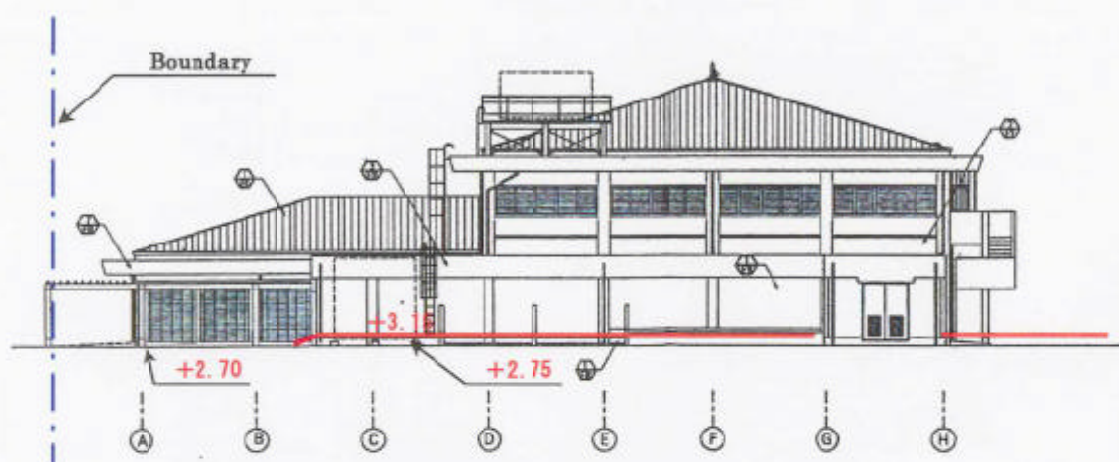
(1) Concept of Ground Floor Elevation
